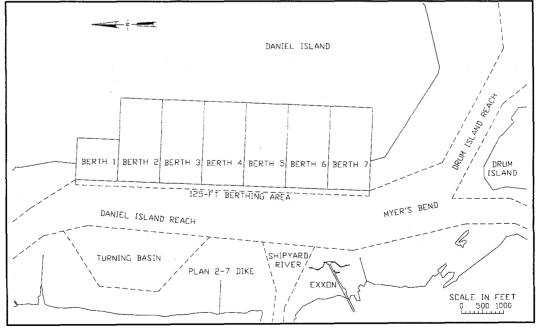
Daniel Island Terminal location, Plans 2-5 and 2-7
